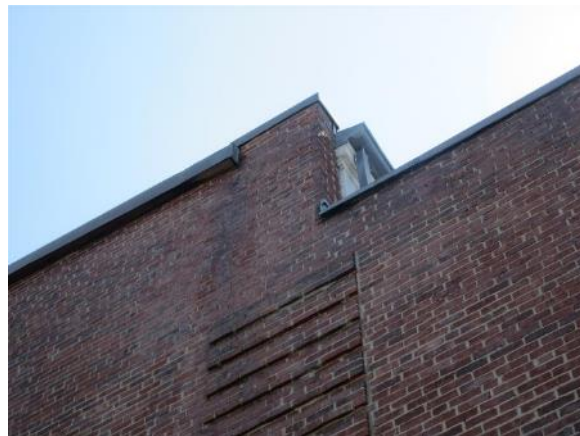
Staining on brick masonry appearing to originate from the roof flashing
